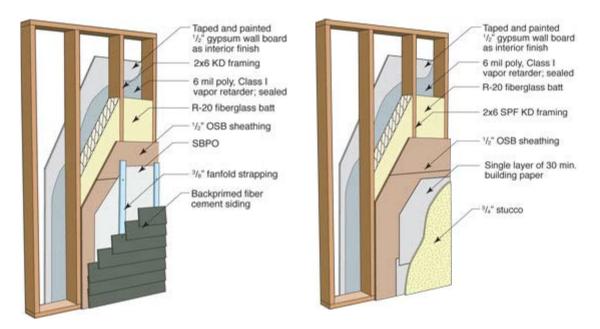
North/South Wall 5 - drained and ventilated, poly vapor control
